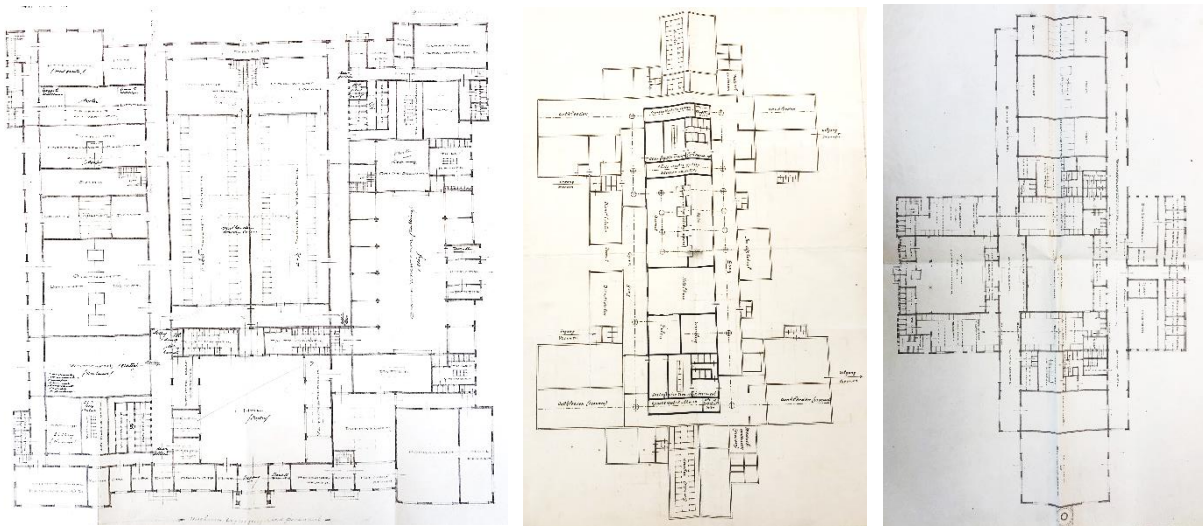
Sketch designs of Decontamination building (Stadsarchief Rotterdam)
